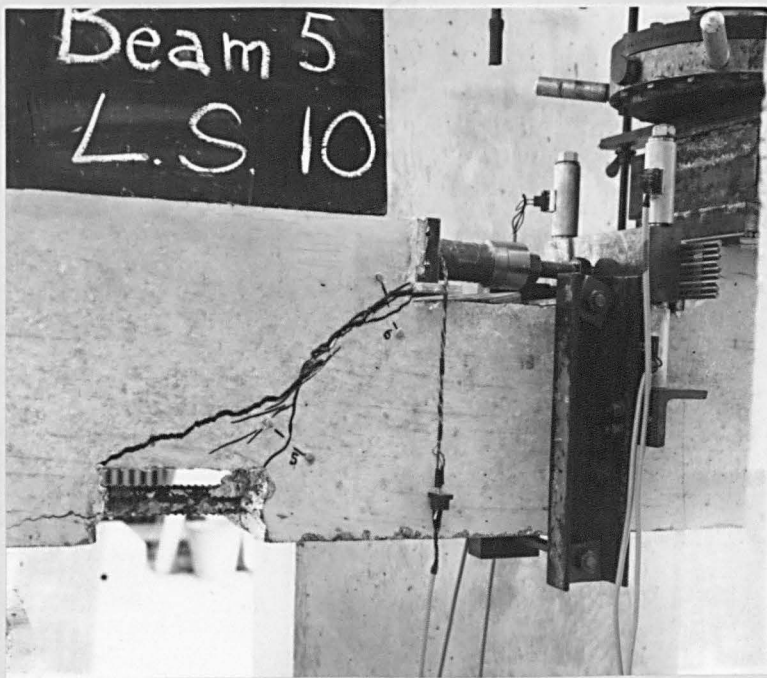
Prefomed crack on beam D5 at finish of test
